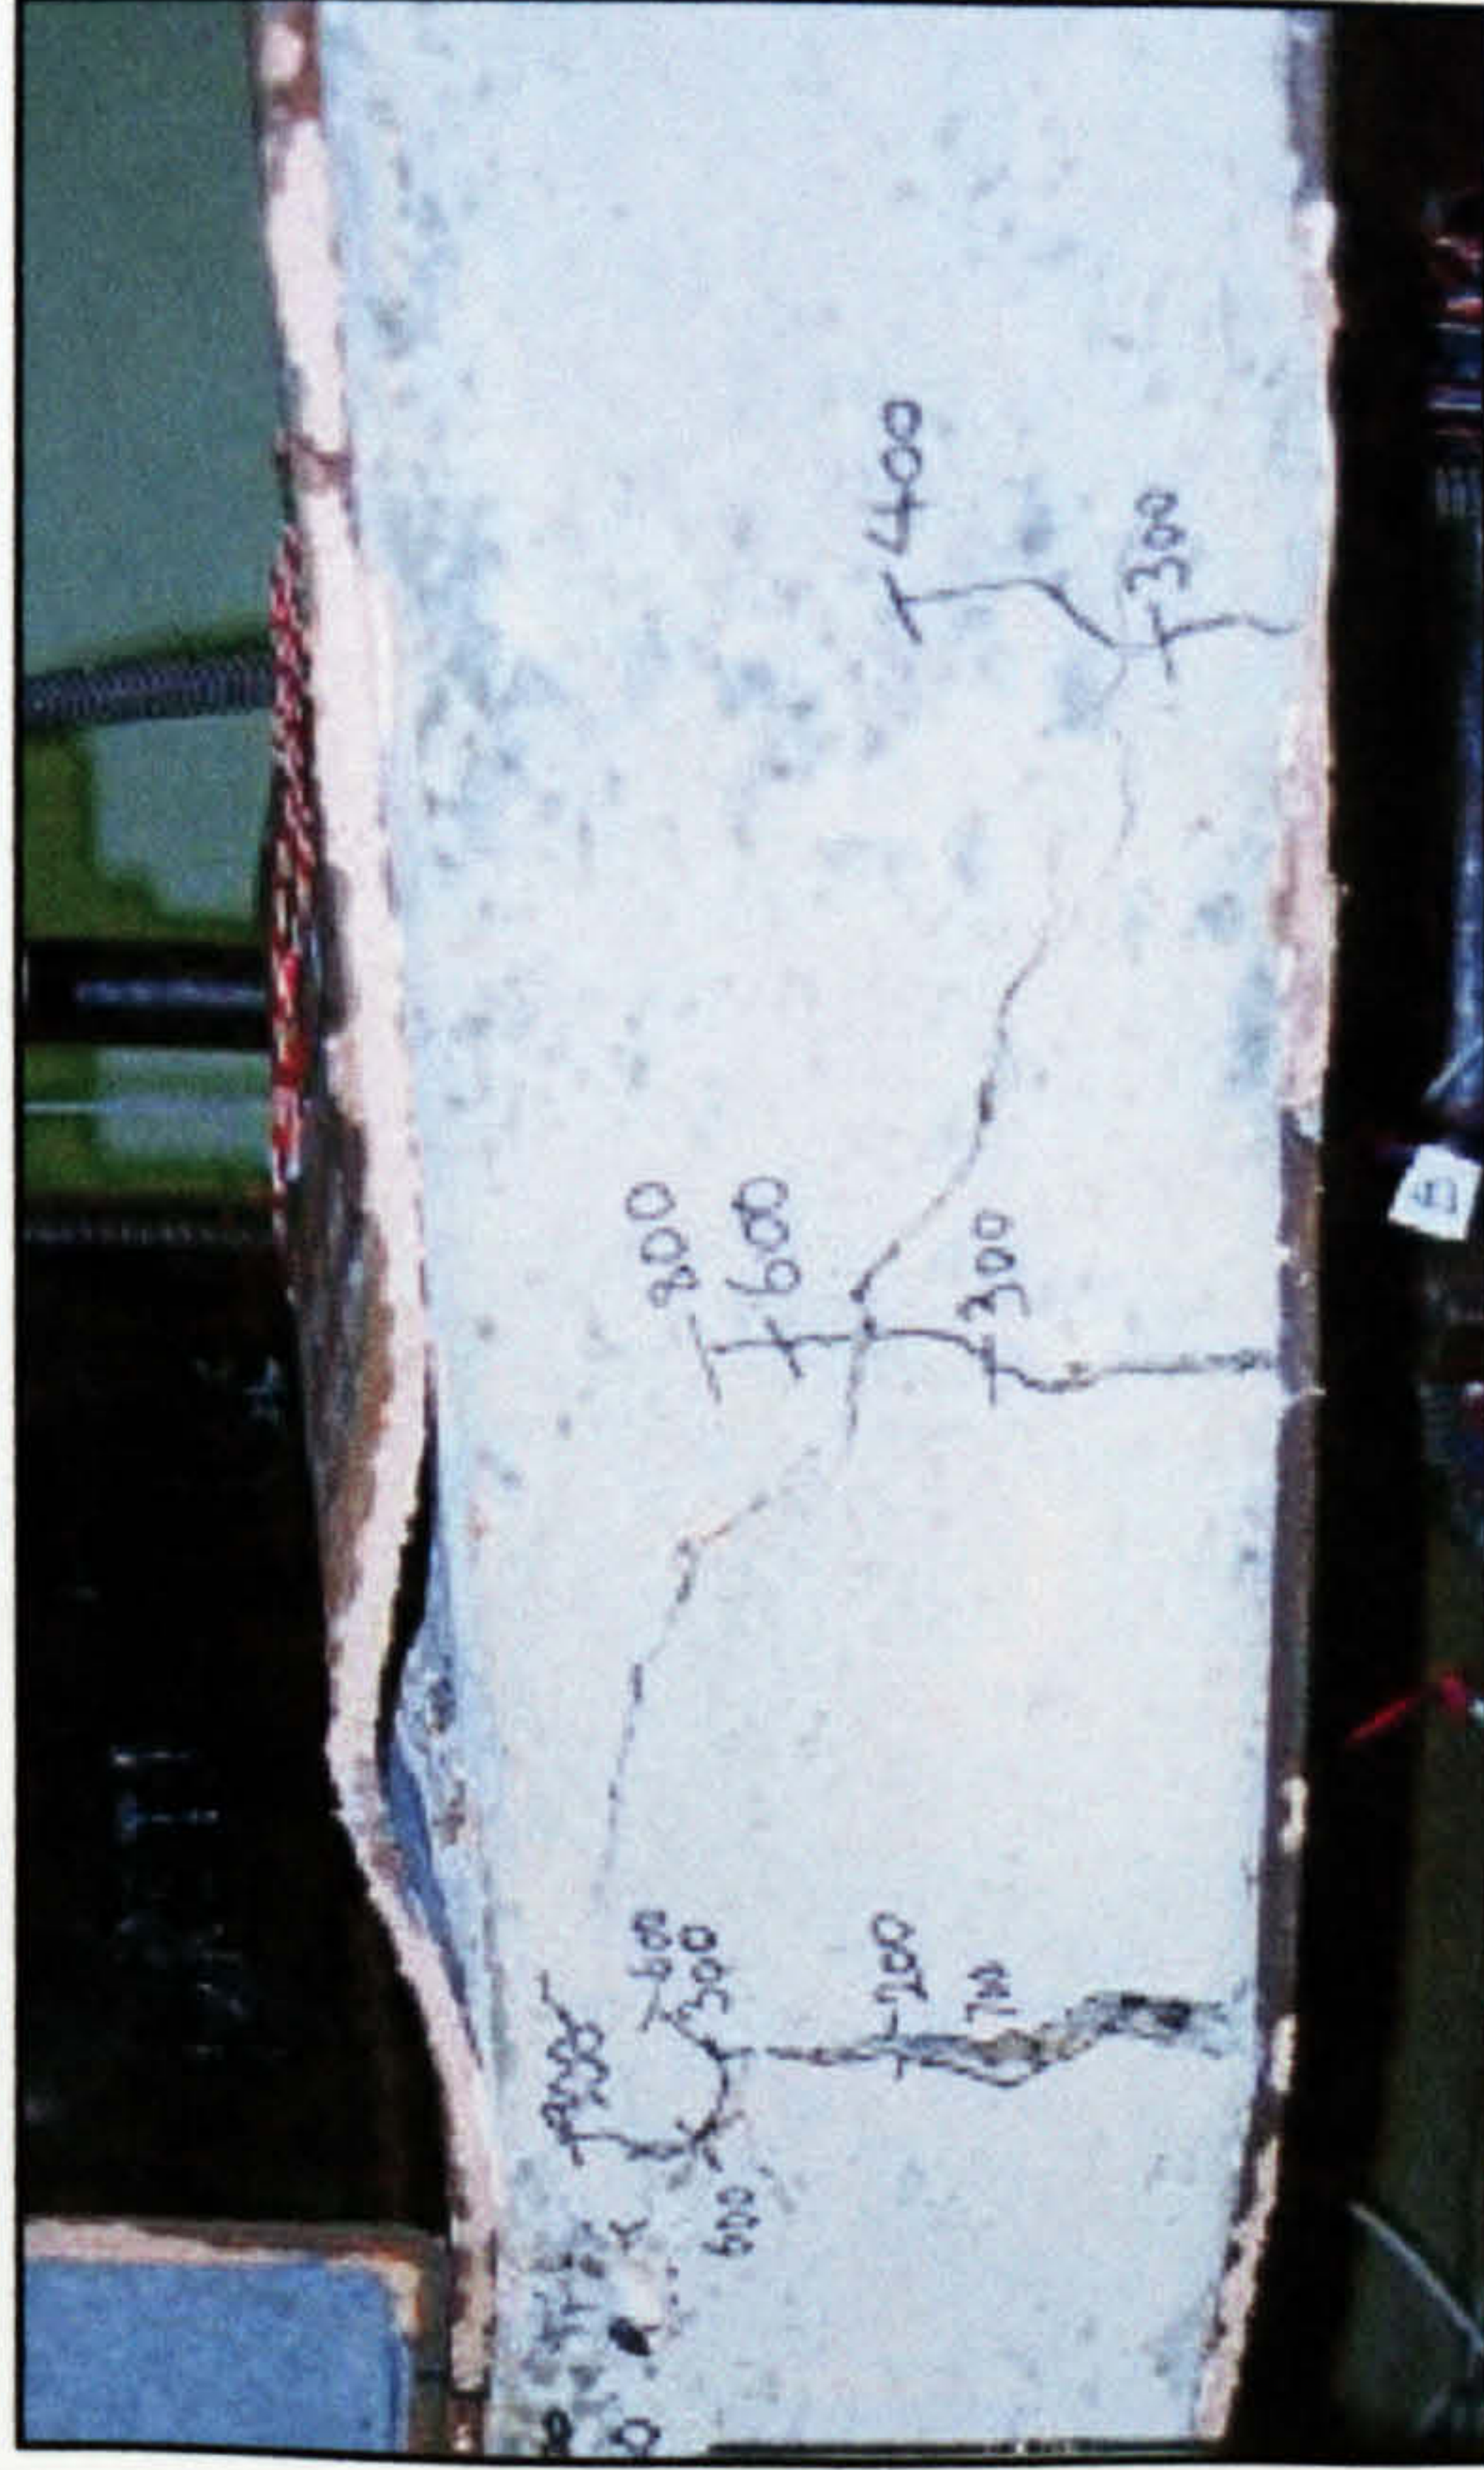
Close-up of failed area showing concrete cracks originating from connector locations. Crack progression is marked in black for load (kN).
